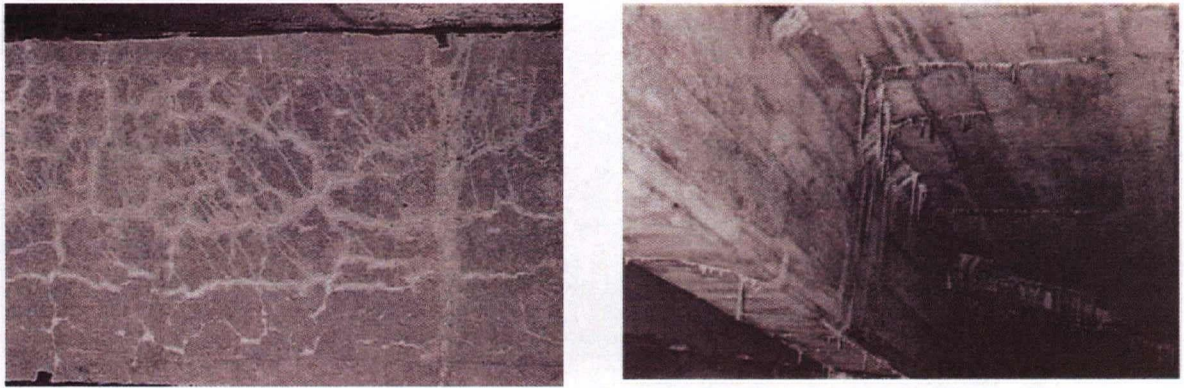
Signs of Concrete Deterioration: (a) Efflorescence; (b) Leaching
